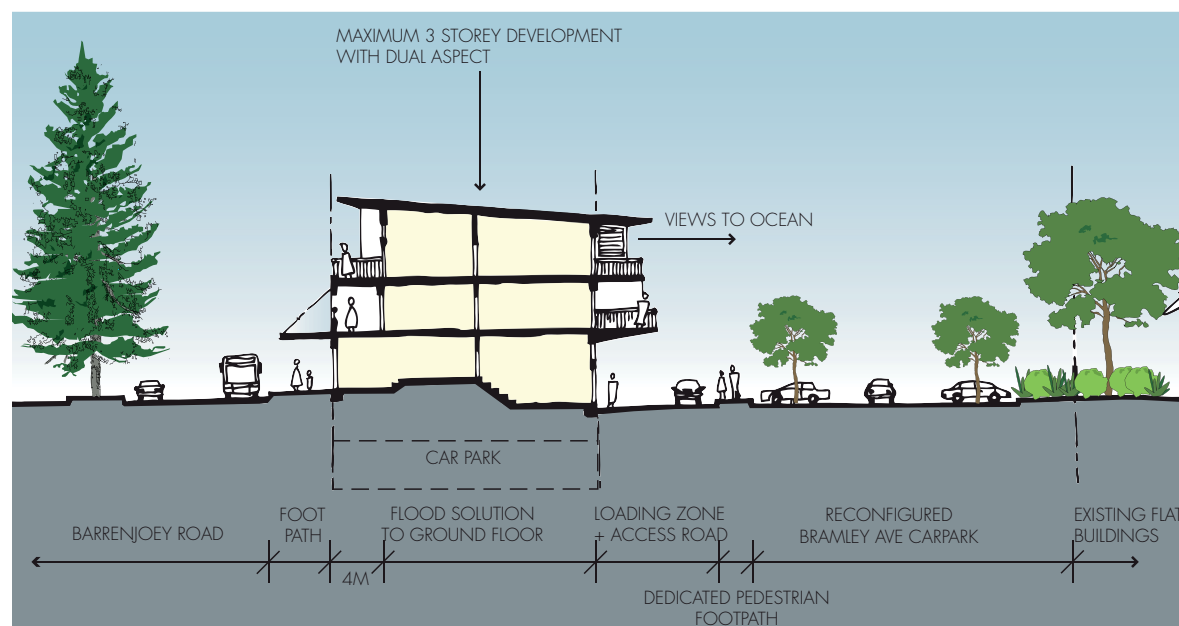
Barrenjoey Road northern entry, looking north
